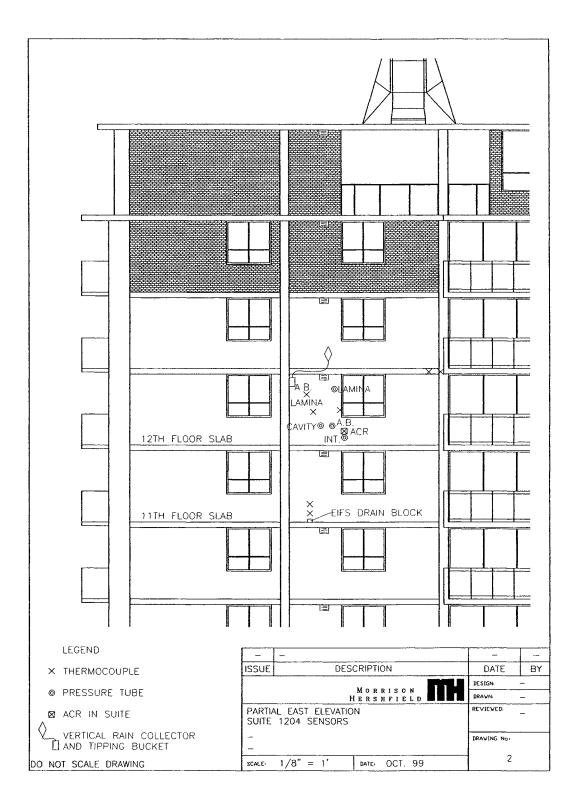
Drawing No. 2: Partial East Elevation – Suite 1204 Sensors
